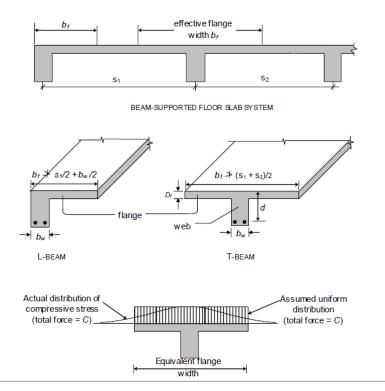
T-beams and L-beams in beam-supported floor slab systems
